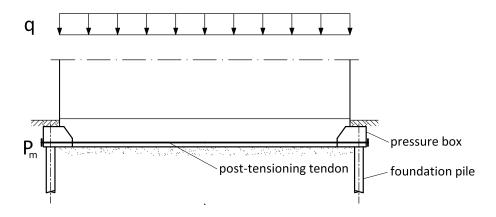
Side view of prestresssed masonry wall (by author).
